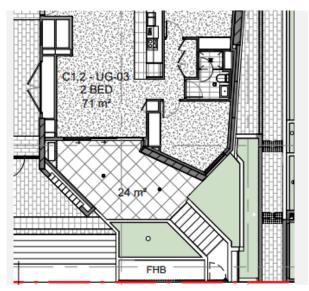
Stage 1 Mod 5 – Upper Ground Floor Plan extract, Rev E
